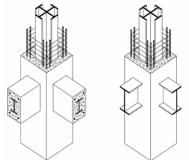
The combination of cross-shaped encased SRC columns and SRC beams or steel beams.
